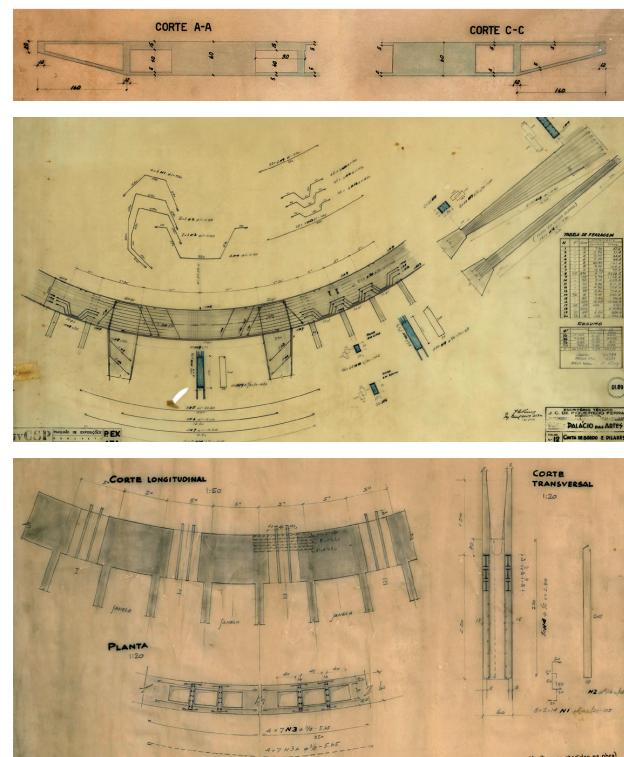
a) Structure of the 1st floor slab, 1953 - there is a reduction in height at the edges of the slabs - (no scale). b) Detail of the slanted pillars below the fastening strap, 1953. c) Internal ducts designed to allow the passage of installations between the shells, 1953. Sources: Figueiredo Ferraz Office / Municipal Historical Archive - SMC/PMSP / Figura 9. a) Detalle de los pilares inclinados abajo del cinturón del borde, 1953. b) Ductos internos previstos para el pasaje de las instalaciones entre las cáscaras, 1953. c) Estructura de la losa del primer piso, 1953 – Se verifica la disminución de la altura en los bordes de las losas - (s/escala). Fuente: Escritório Figueiredo Ferraz / Arquivo Histórico Municipal - SMC/ PMSP.
